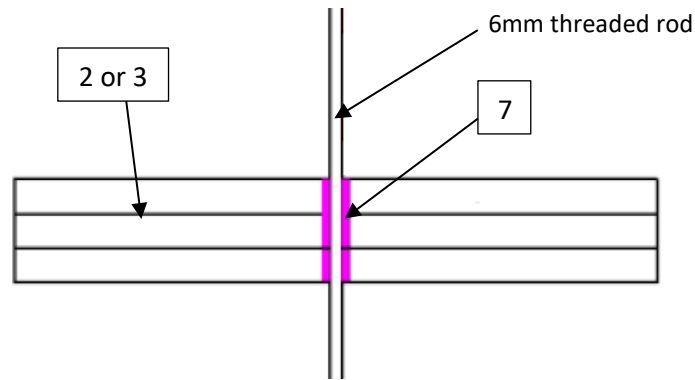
Additional sealant protection for floor-ceiling system with a false ceiling beneath
